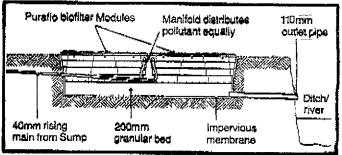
(a) Puraflo system discharging treated effluent into open ditch, stream or river
